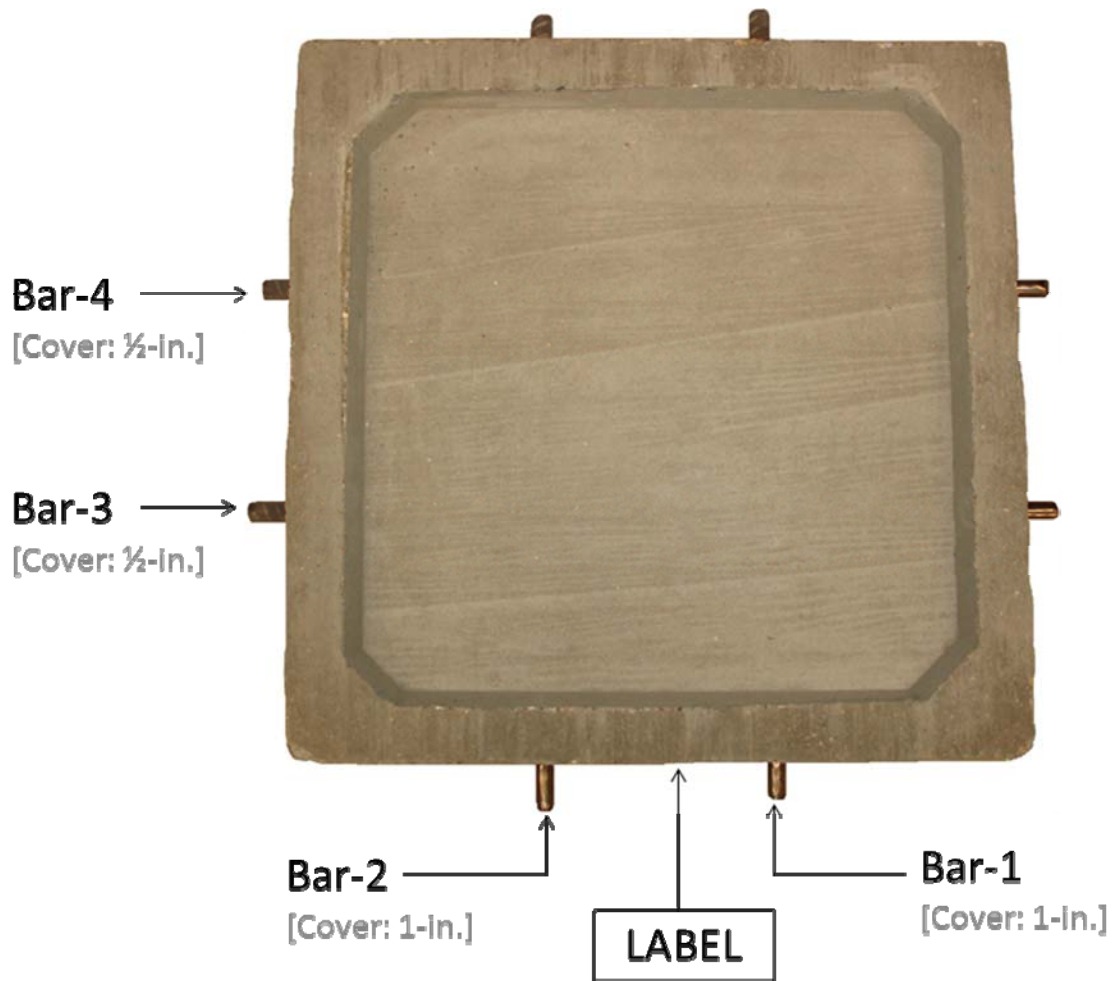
Labeling of bars embedded within a ponding specimen with respect to the specimen's label.
